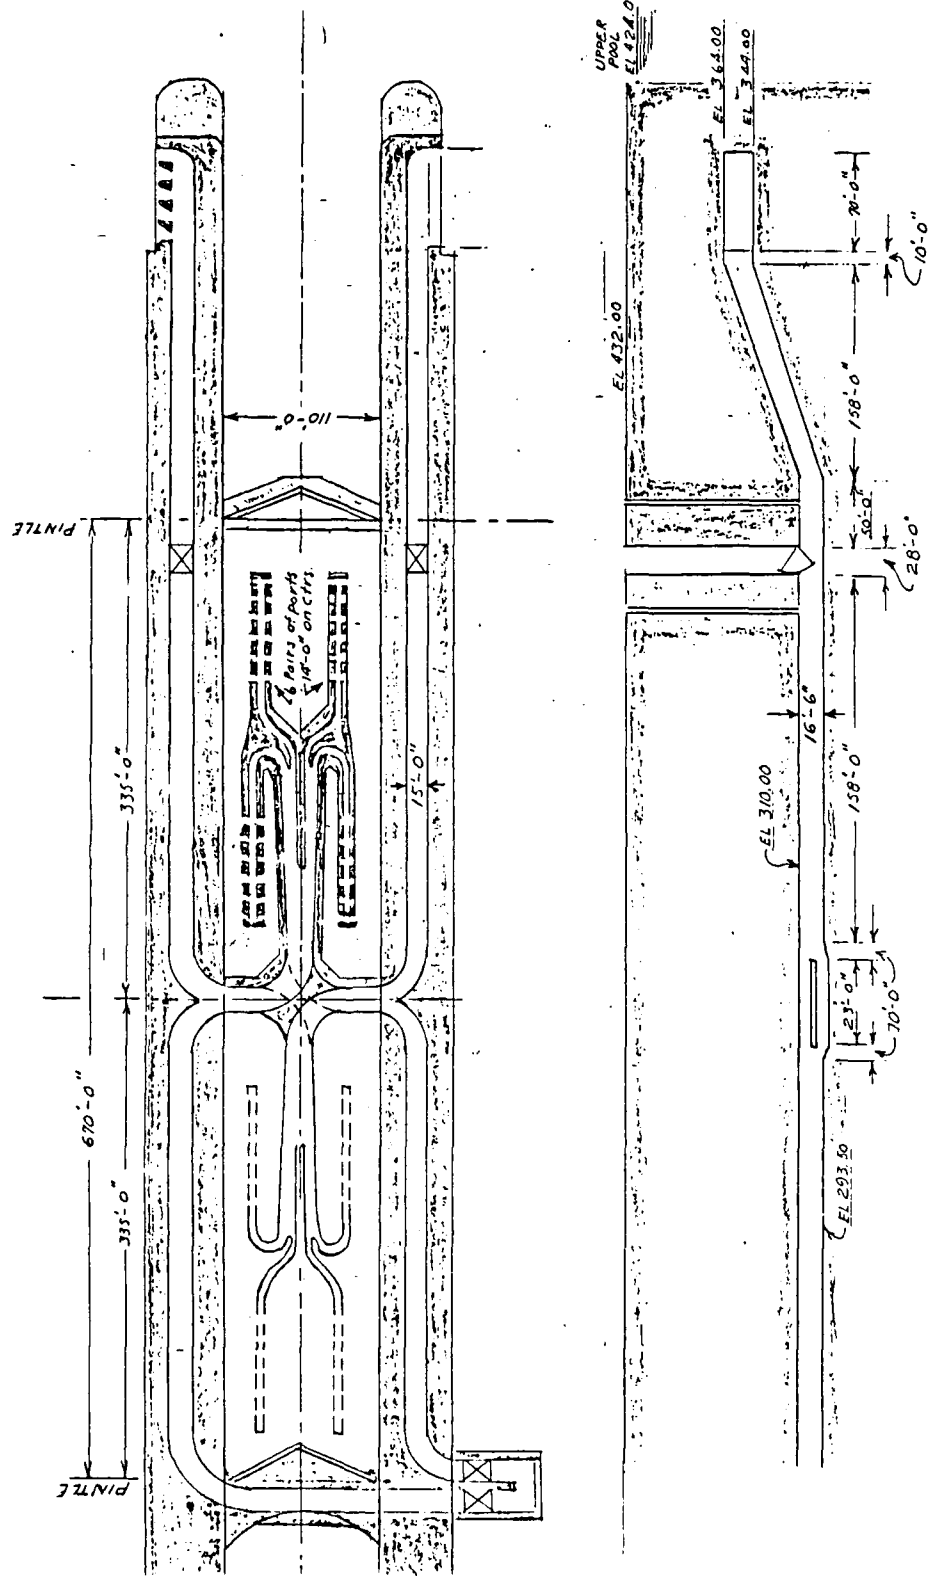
Design of bottom longitudinal filling and emptying system, sectional plan and elevation
